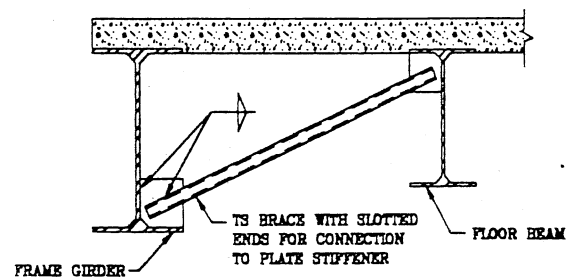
Floor beam connection to provide lateral support for lower flange of girder.
